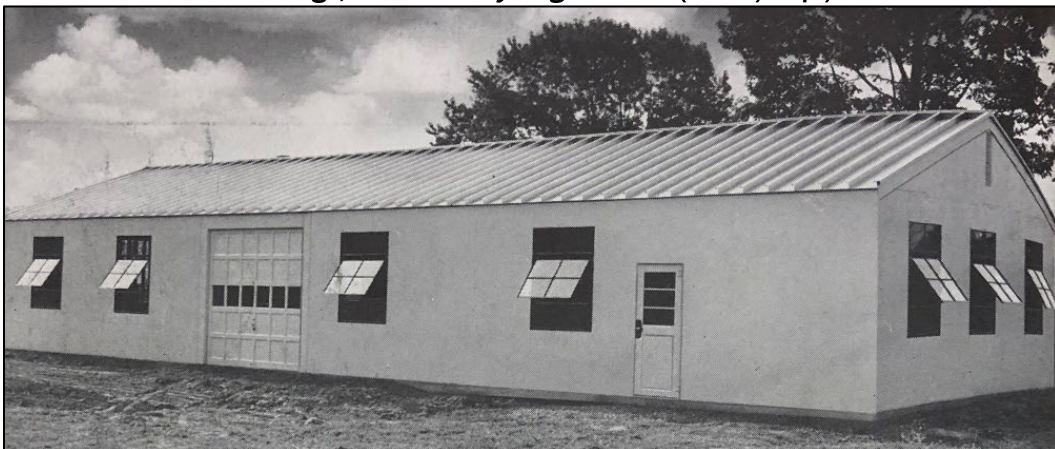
Steelox building with three roof ventilators and a sliding door (American Rolling Mill Company, "Armed Forces Building," *The Military Engineer* 44, no. 298 (March–April, 1952): 15).
